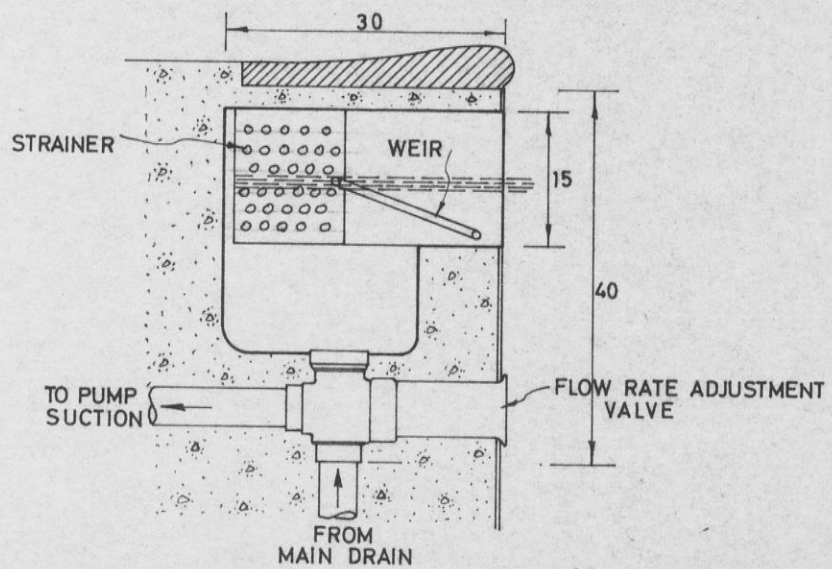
(b) TYPICAL SECTION THROUGH SURFACE SKIMMER
